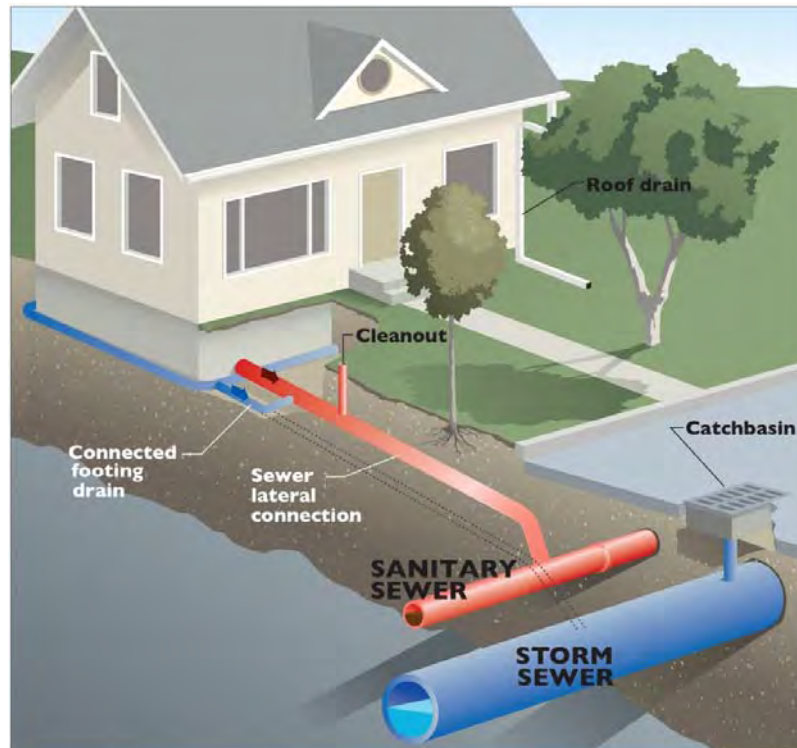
Footing drains direct stormwater flow away from a building. In many structures built before 1981, footing drains were connected directly to the sanitary sewer system.
